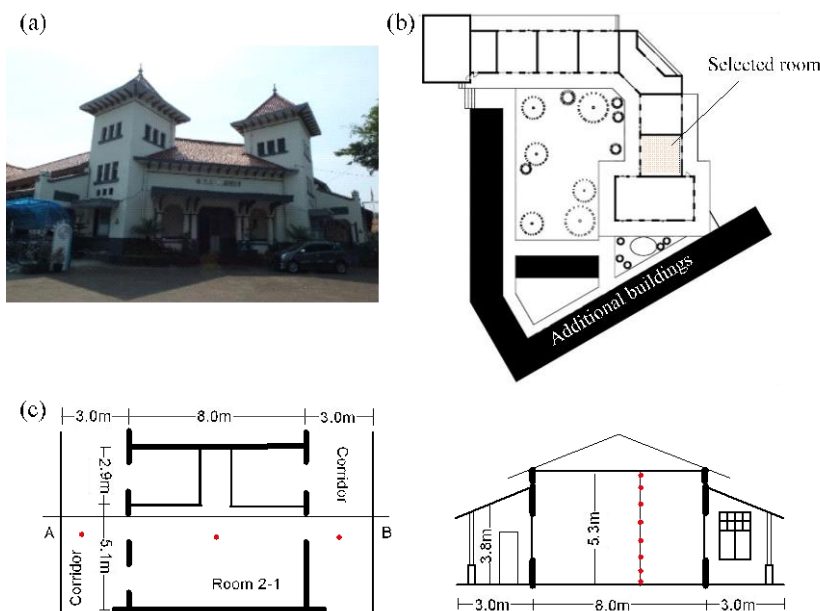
Case study buildings: (a) Views of Case study 2, (b) Floor plan of Case study 2 and (c) Floor plan and section of selected room (Room 2-1).
